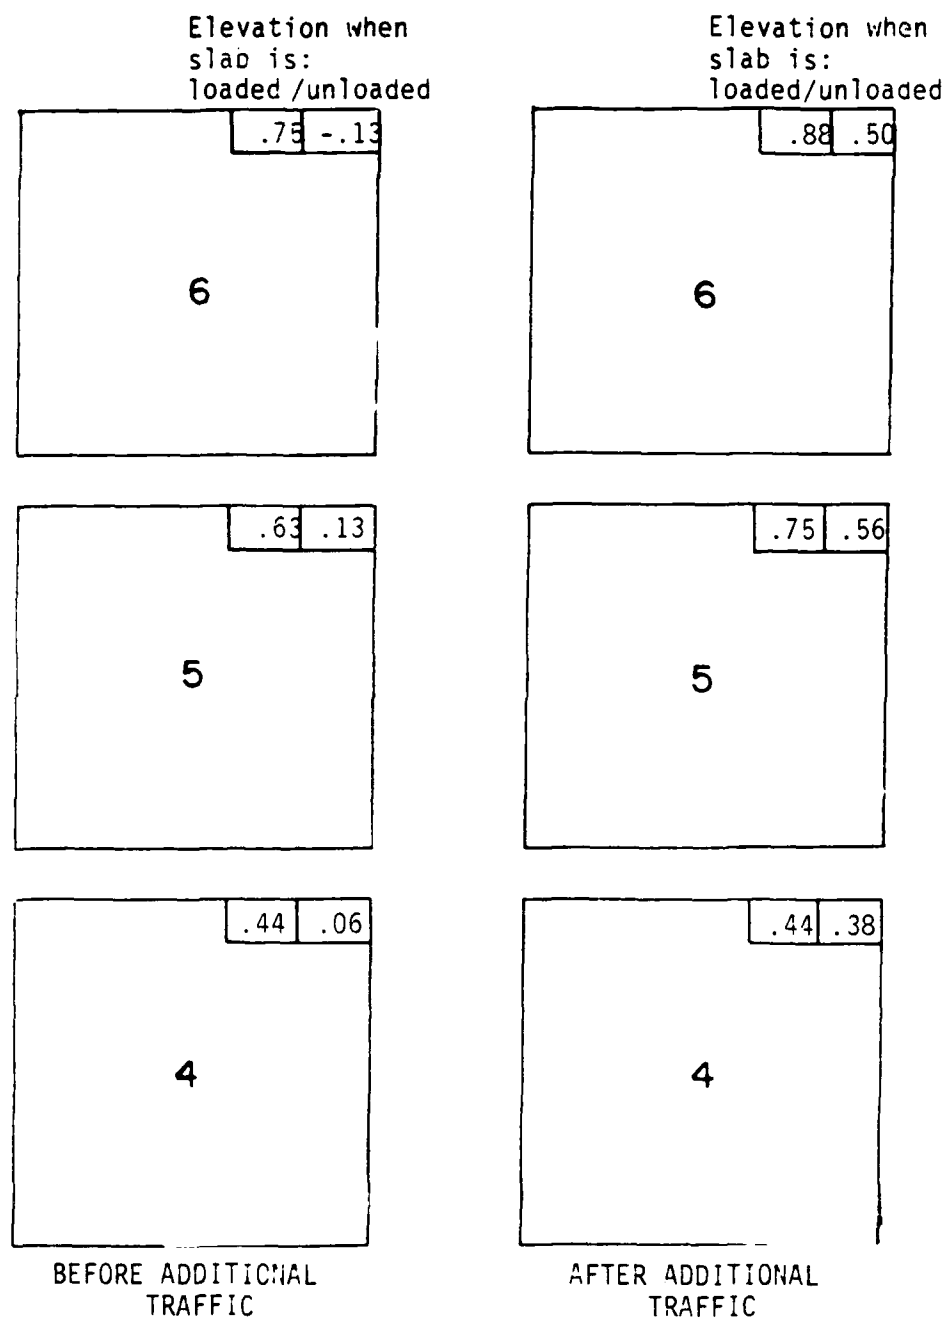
Slab Corner Elevation Measurements Before and After Static Loadcart Placement, Test 2: 2-Meter Slabs - Uncompacted Ballast Rock Fill with Number 57 Leveling Course.
